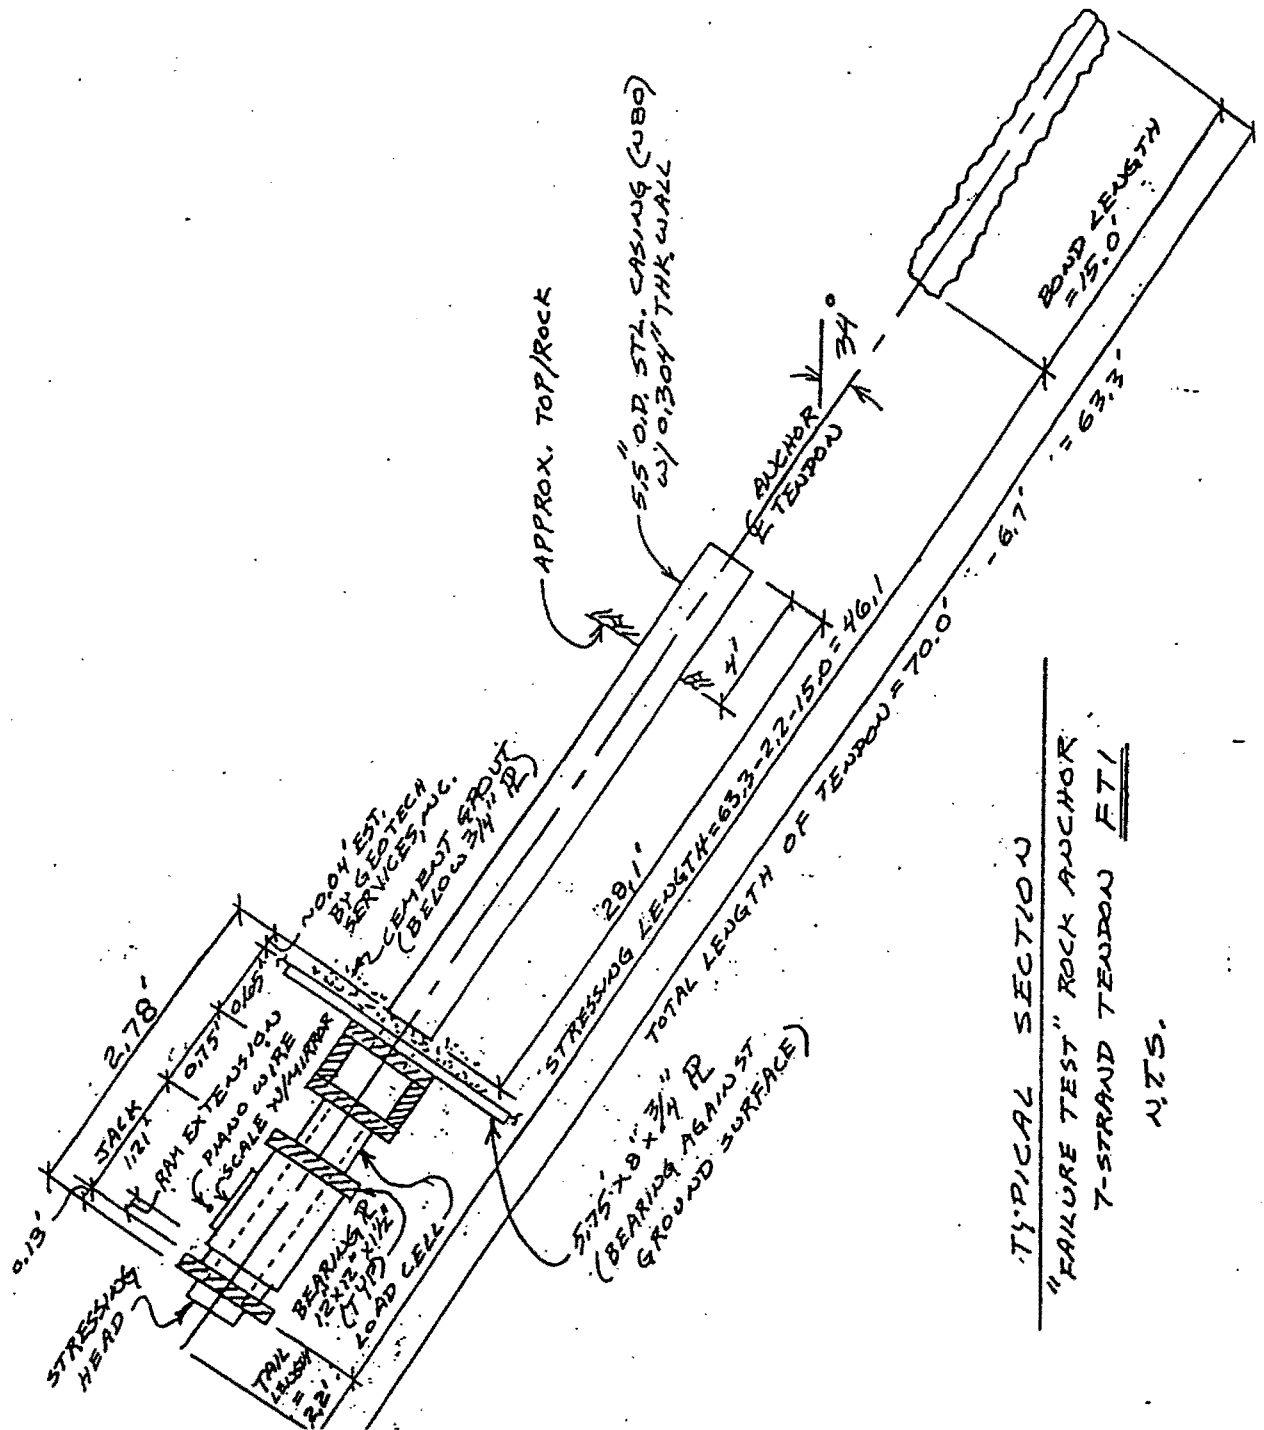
Typical cross-section of failure test FT1
